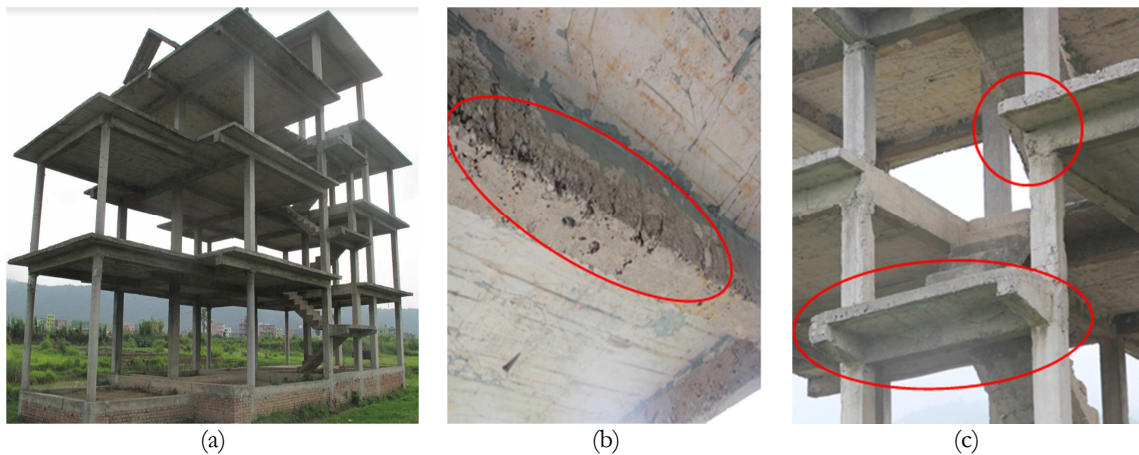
Description of the MRT1 building as observed in site survey; (a) 3-D view, (b) Reinforcement exposed on the beam and poor concrete quality and (c) Short-column at the staircase landing and improper connection at beam-column joint
